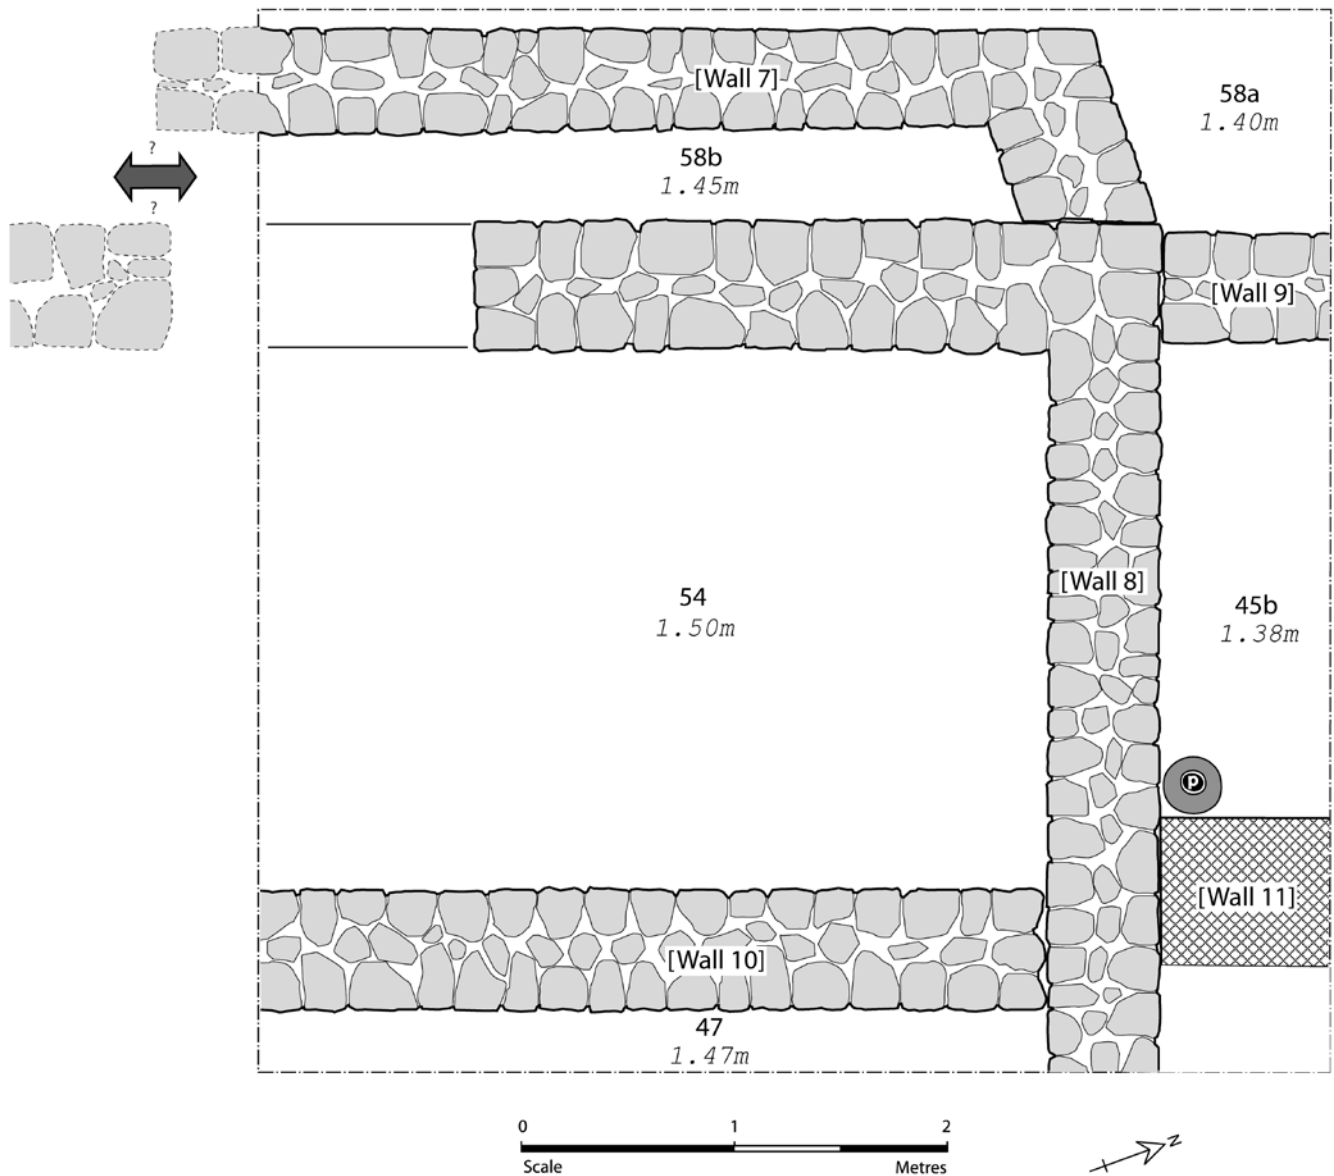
Plan of Ek-A Horizon 12 (showing all contemporary walls).
